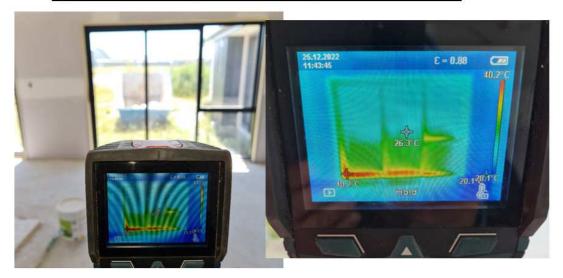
Thermal Image of Door at Lounge on 4 Jan 2023
